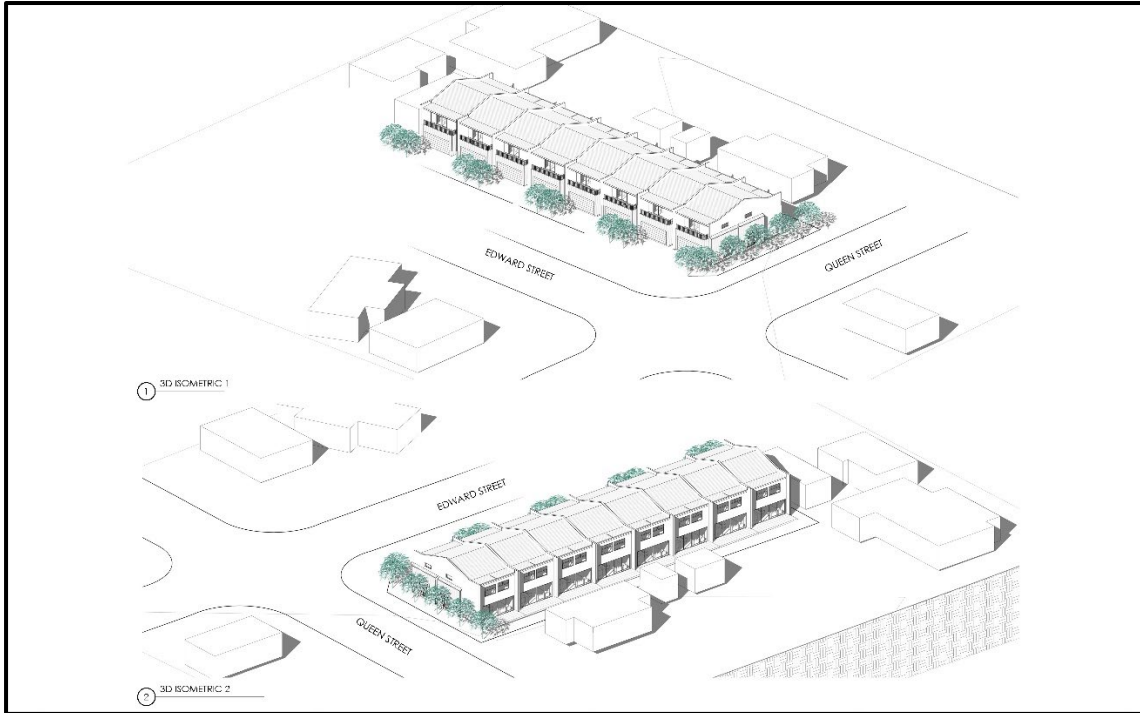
Concept Development Proposal – 3D Isometric Views (*Source: IArchitecture)
